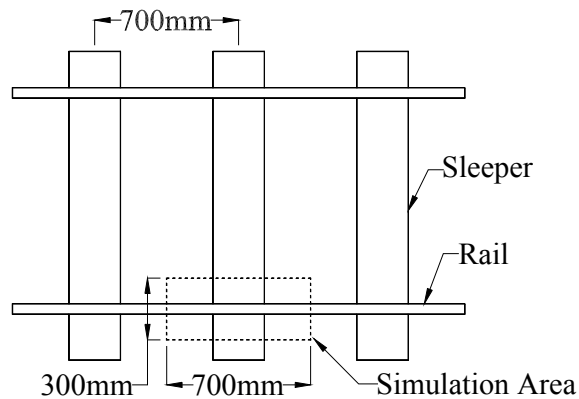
Plan of rail and sleepers showing section represented by the box test (Lim, 2005)
